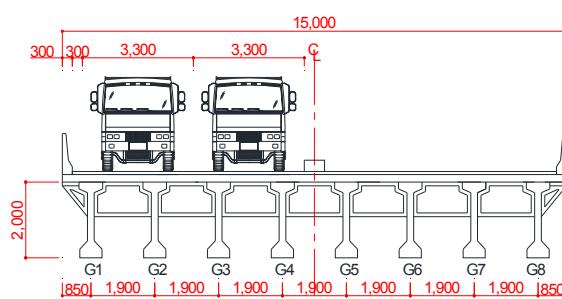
Cross-section of the PSC-I bridge at the mid-span (mm).
